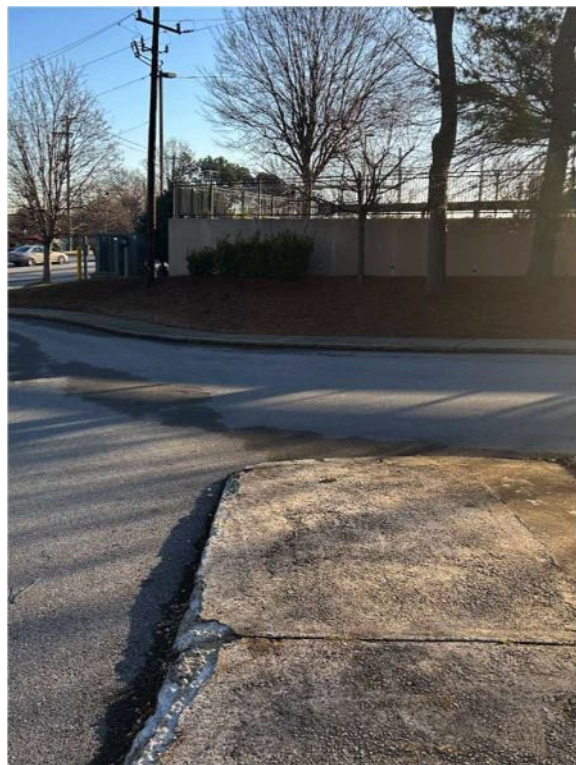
MISSING ADA CURB RAMP AT THE SCHOOL DRIVEWAY
